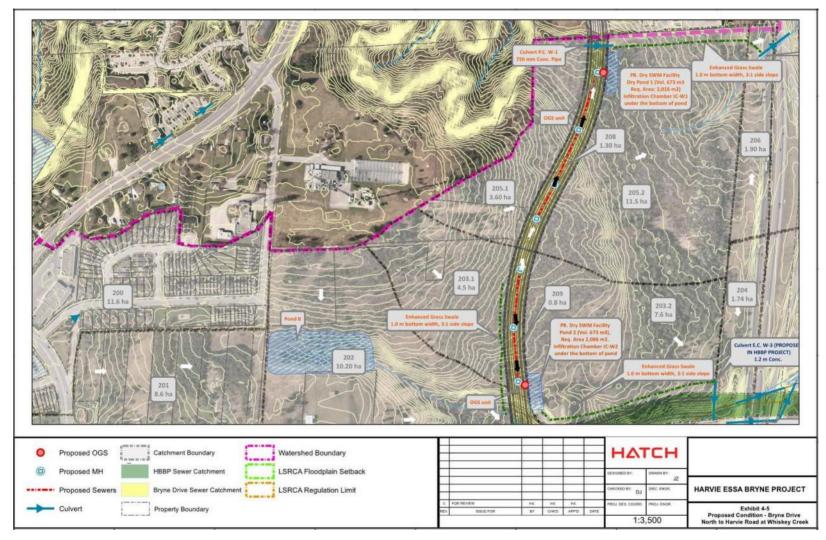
Proposed Drainage Concept - Bryne Drive North of Harvie Road at Whiskey Creek
